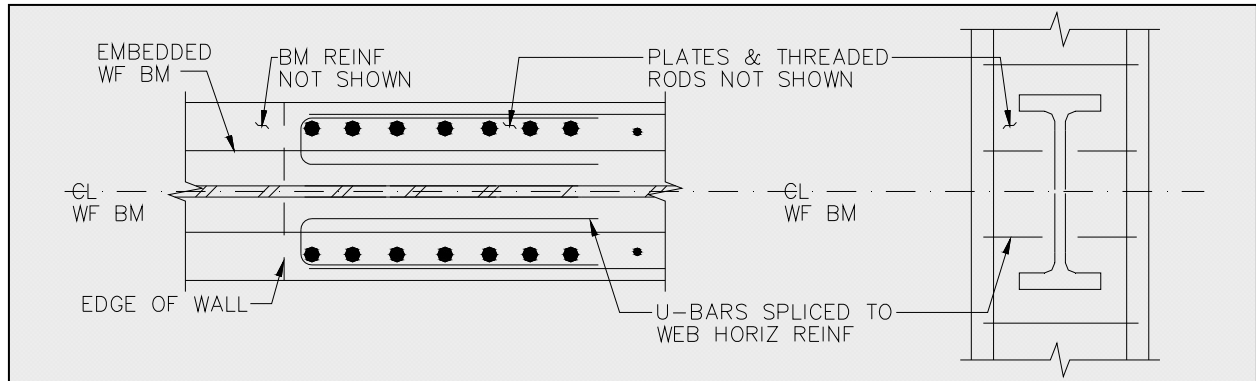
U-Bars Spliced to Horizontal Web Reinforcement at Embedded Steel Section
